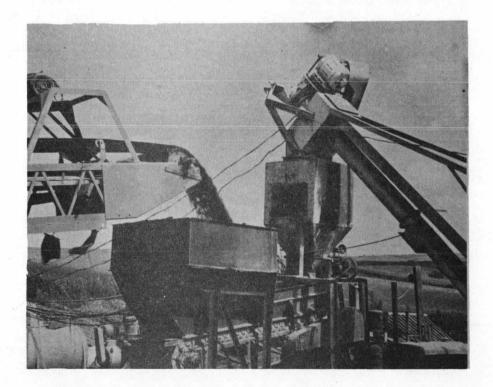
Soil being fed into a surge bin. Note cement hopper to the right.
